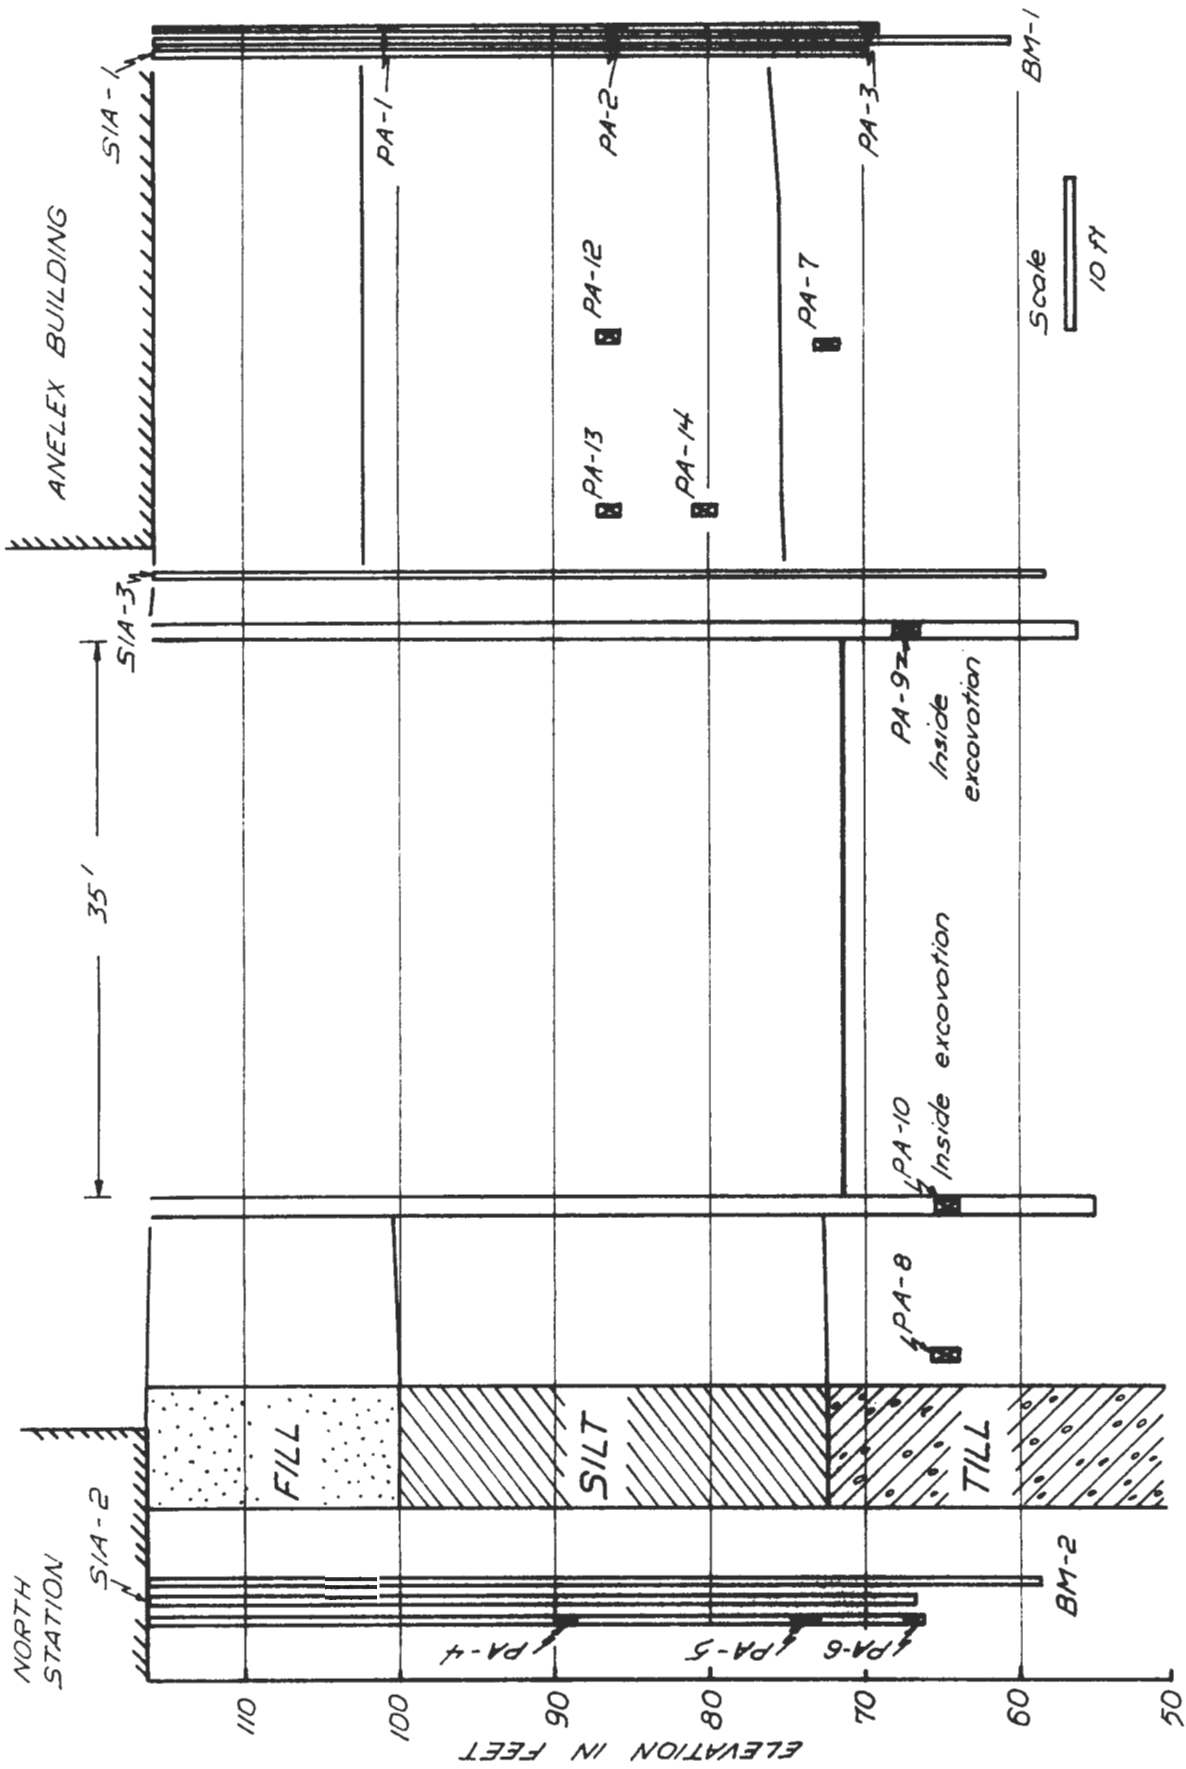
SECTION PP LOOKING NORTH - TEST SECTION A
